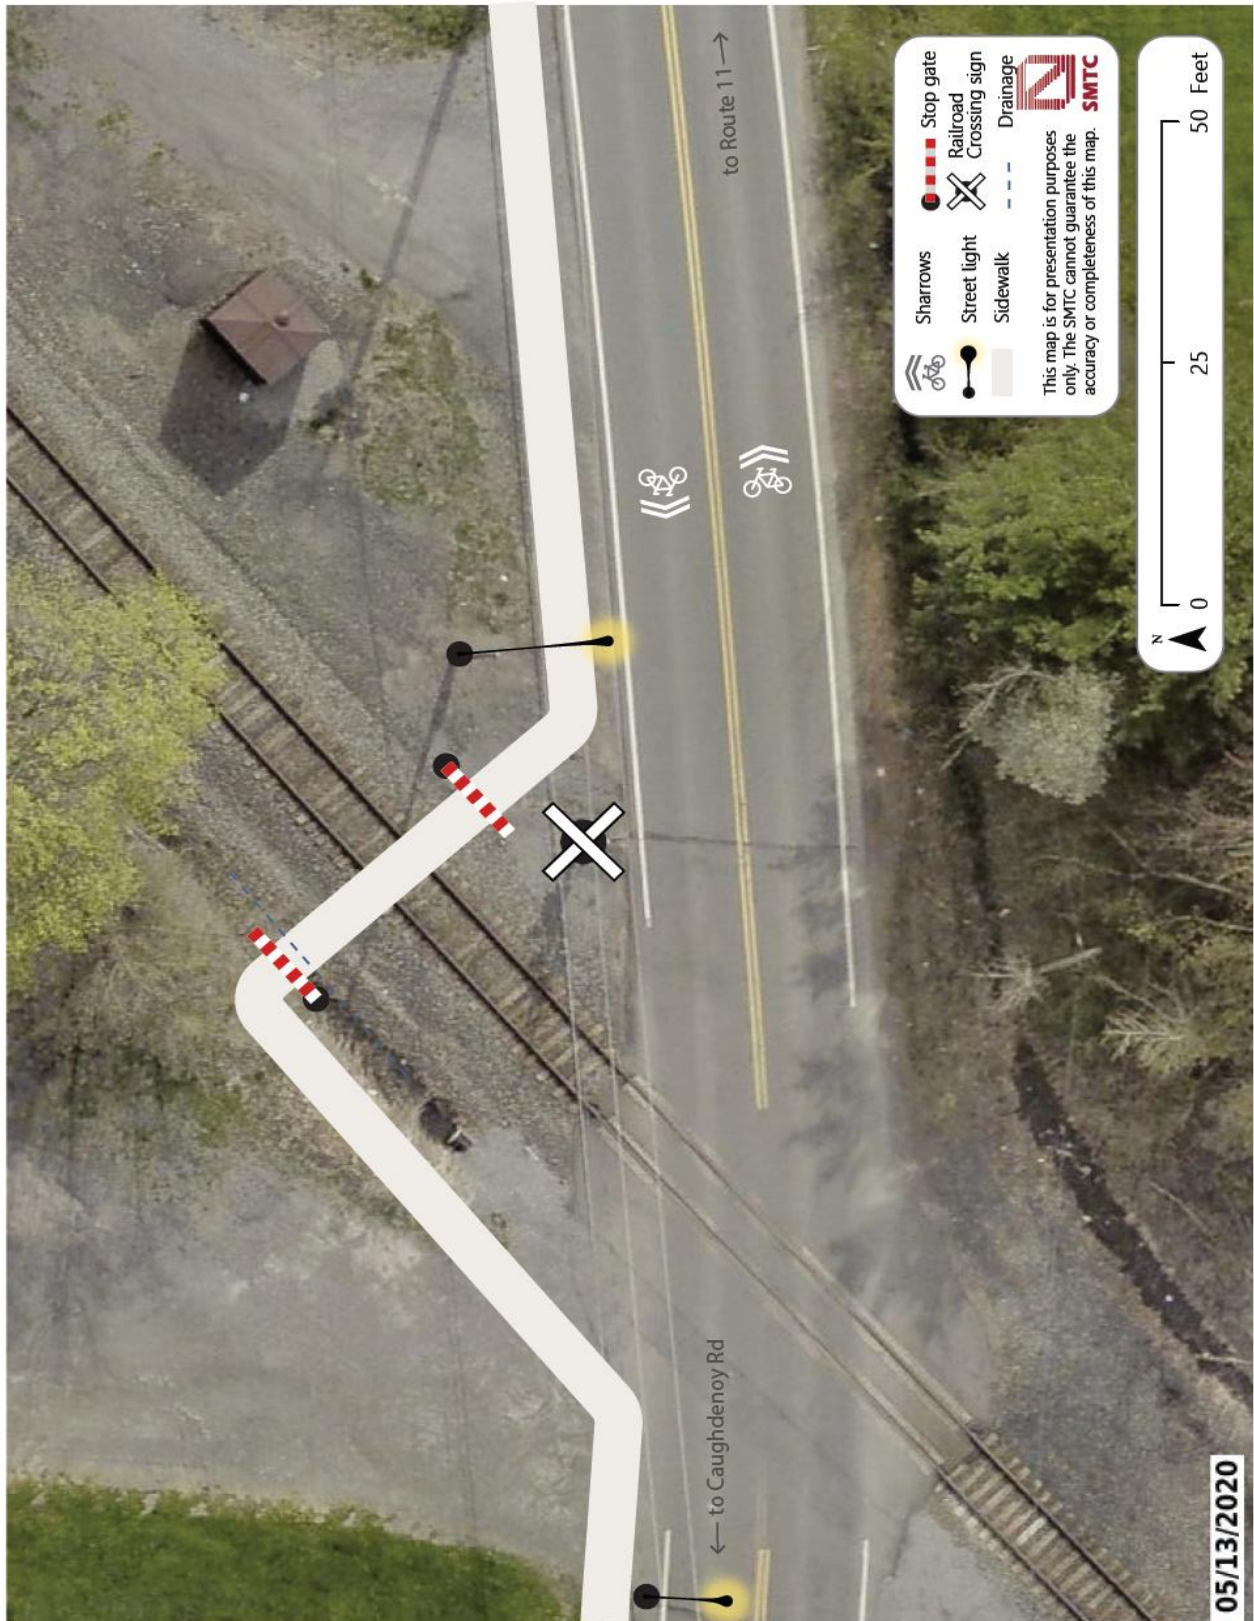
Envisioned Conditions: CSX Railroad crossing at Guy Young Road
